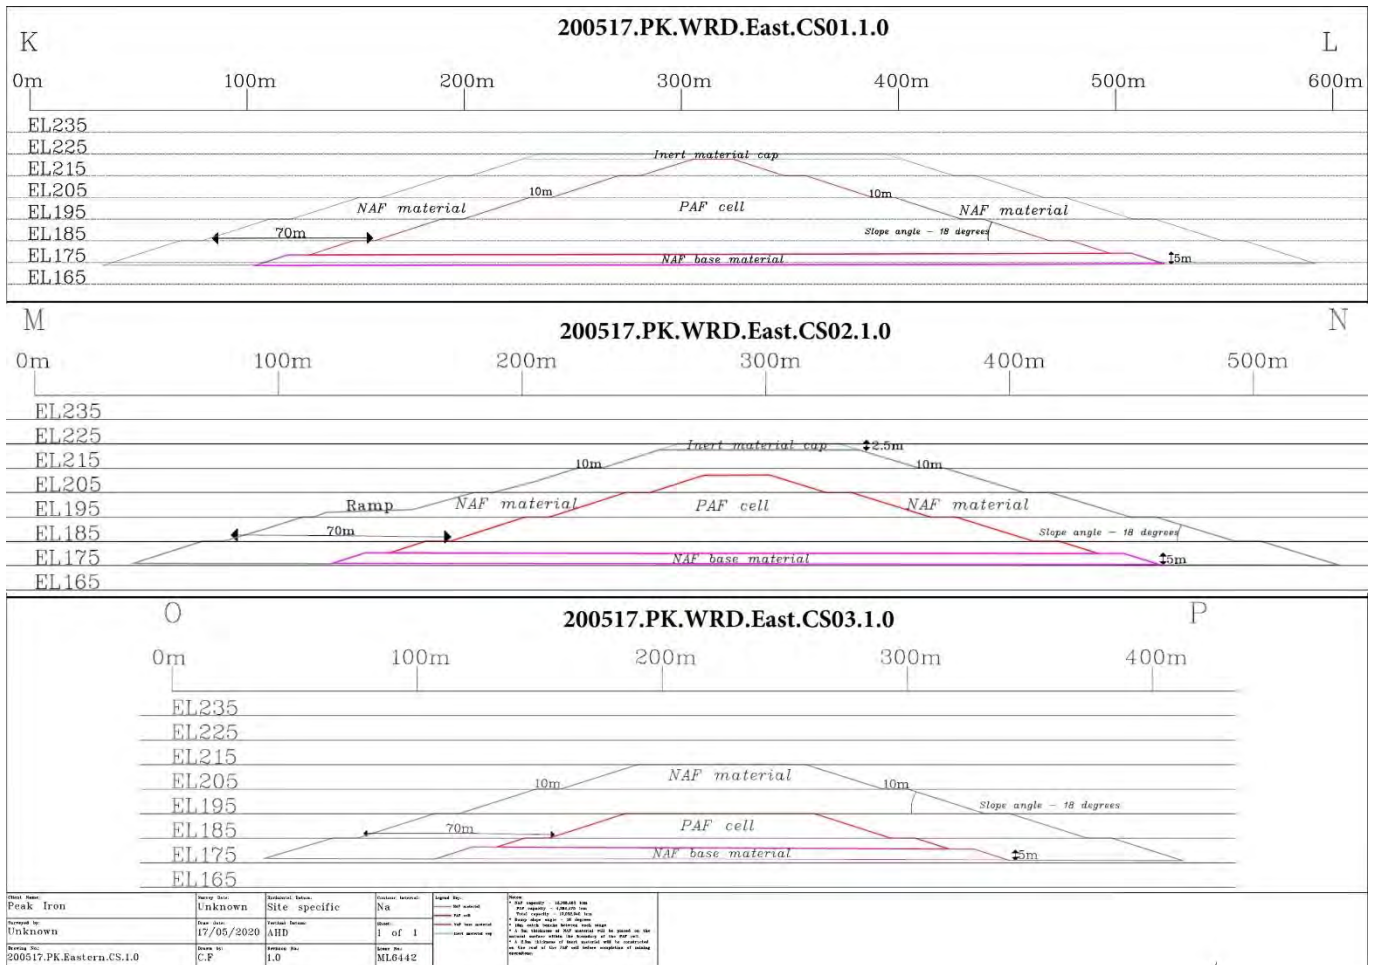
Eastern WRD cross-sections K – L, M – N and O – P
